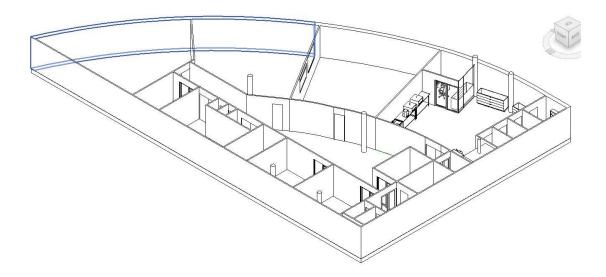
3D not rendered model of D3 with walls, doors, columns and lab equipment
